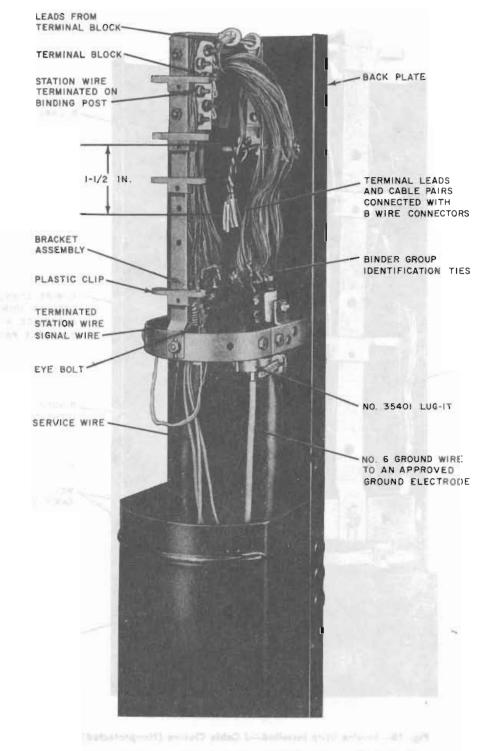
Service Wire Installed—E Cable Closure (Protected)
